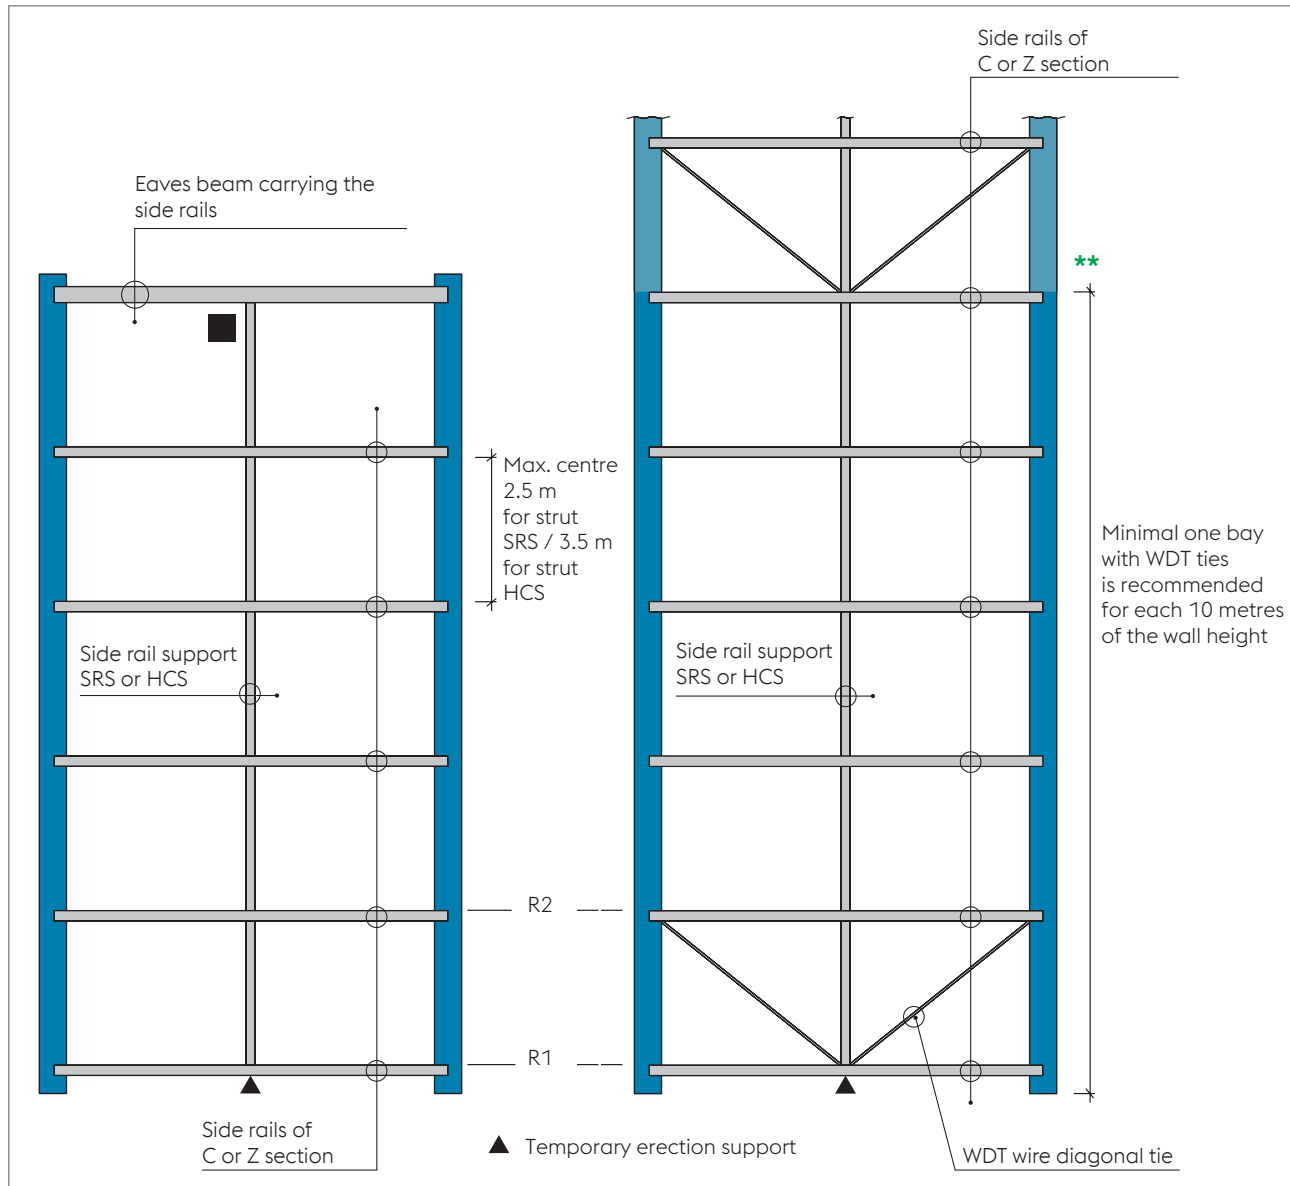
Layout of side rail supports for spans of 3.20 - 6.00 metres
